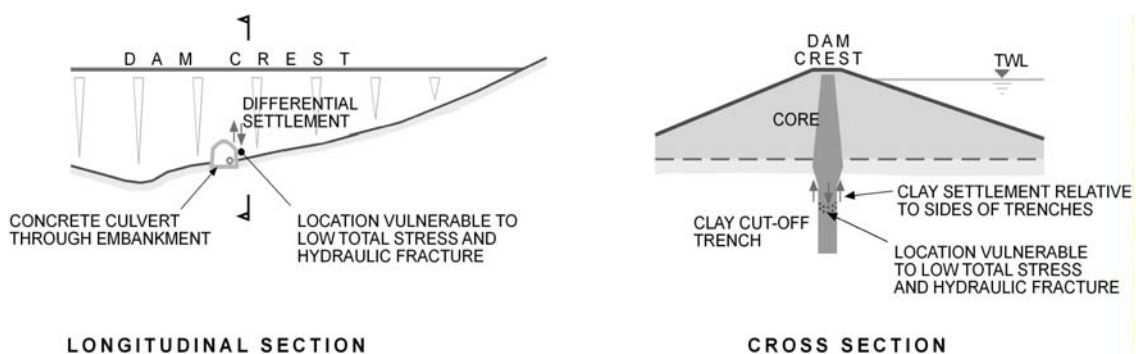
Hydraulic fracture can lead to internal erosion.
